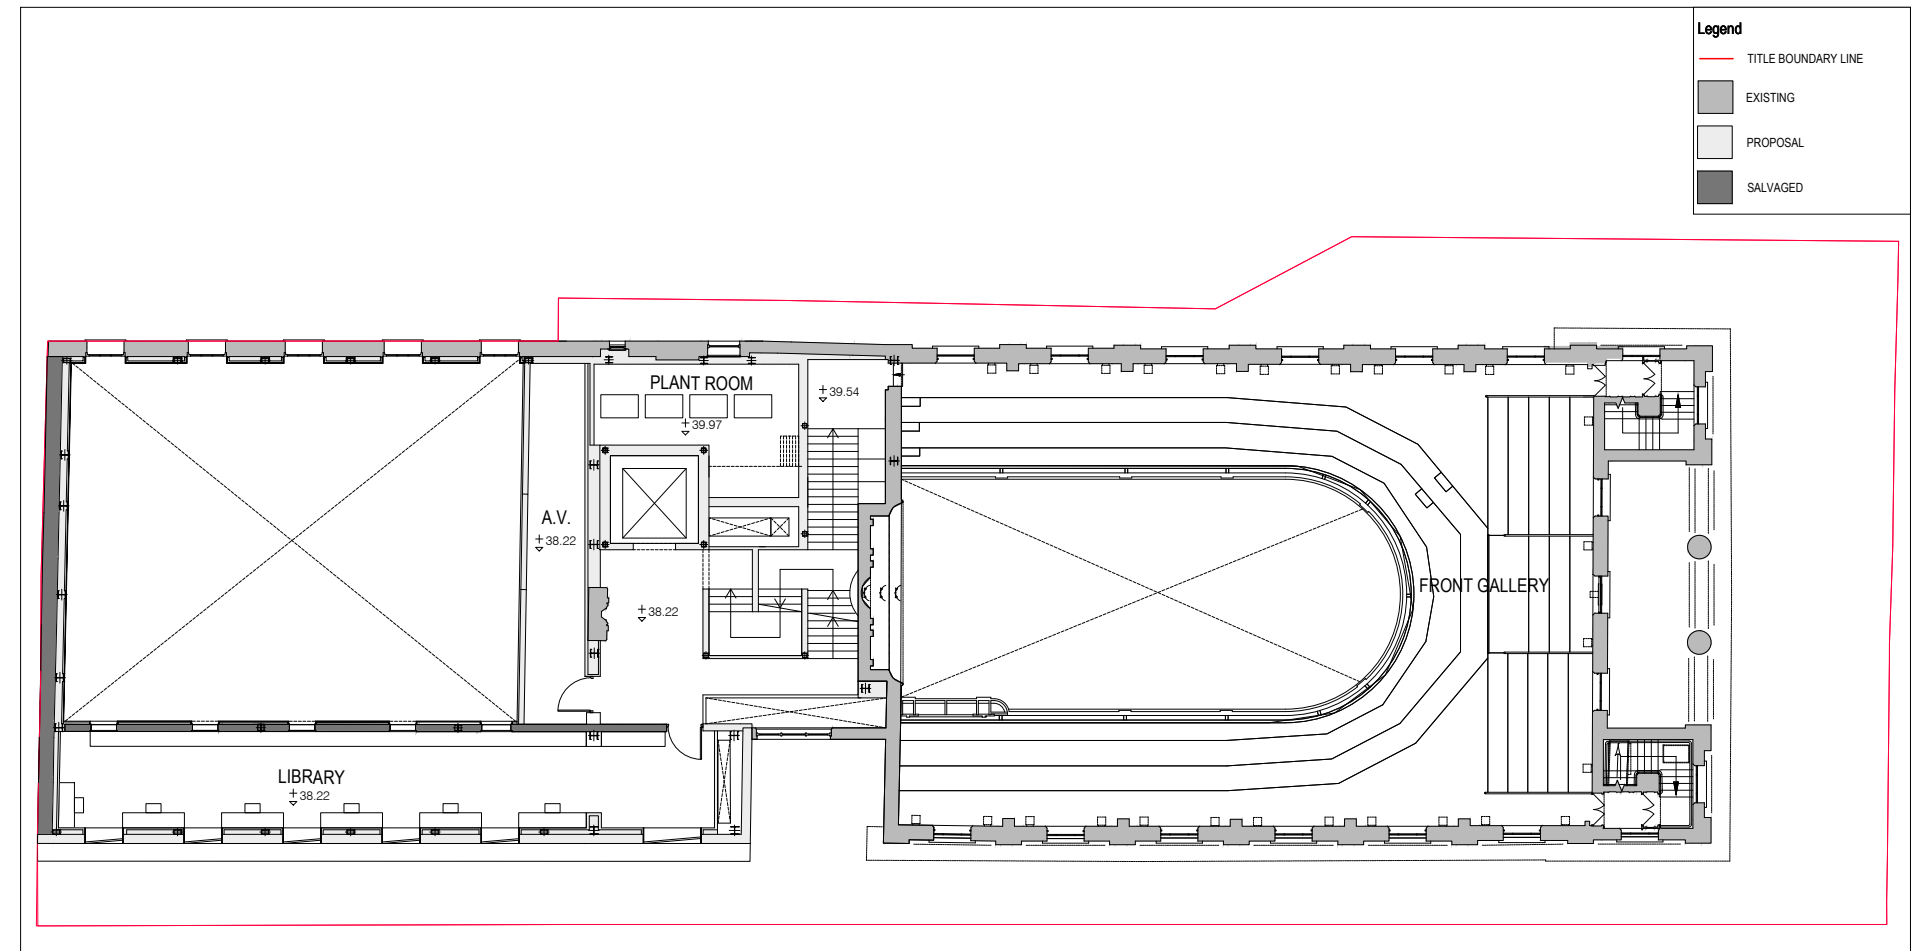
Proposed first floor plan showing the new staircase and lift. Source: Farshid Moussavi Architecture.
